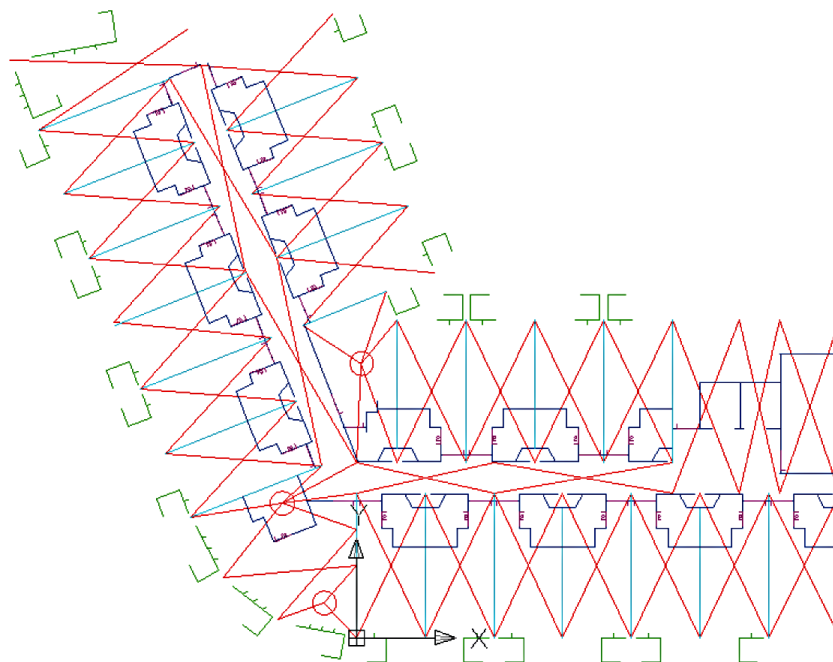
Building plan and 3D model generated by the BIM: Building plan
